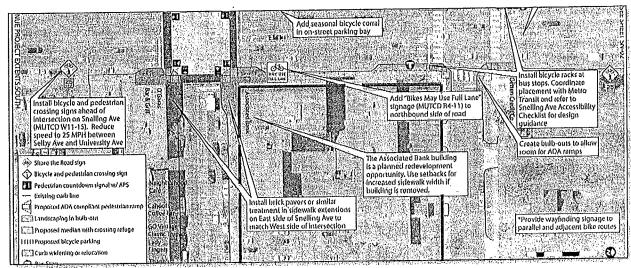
illustrates the proposed multi-modal recommendations that impact the east side of Snelling Avenue between Selby and Dayton Avenues. (NOTE: Crosswalk pavement markings on Snelling at Dayton Avenue are not finalized due to the MnDOT proposal to extend the southbound left turn lane on Snelling northward from Selby through the Dayton intersection, thus precluding the marking of a crosswalk. The bus stop may also be relocated closer to Selby, where the crosswalk will remain.)
